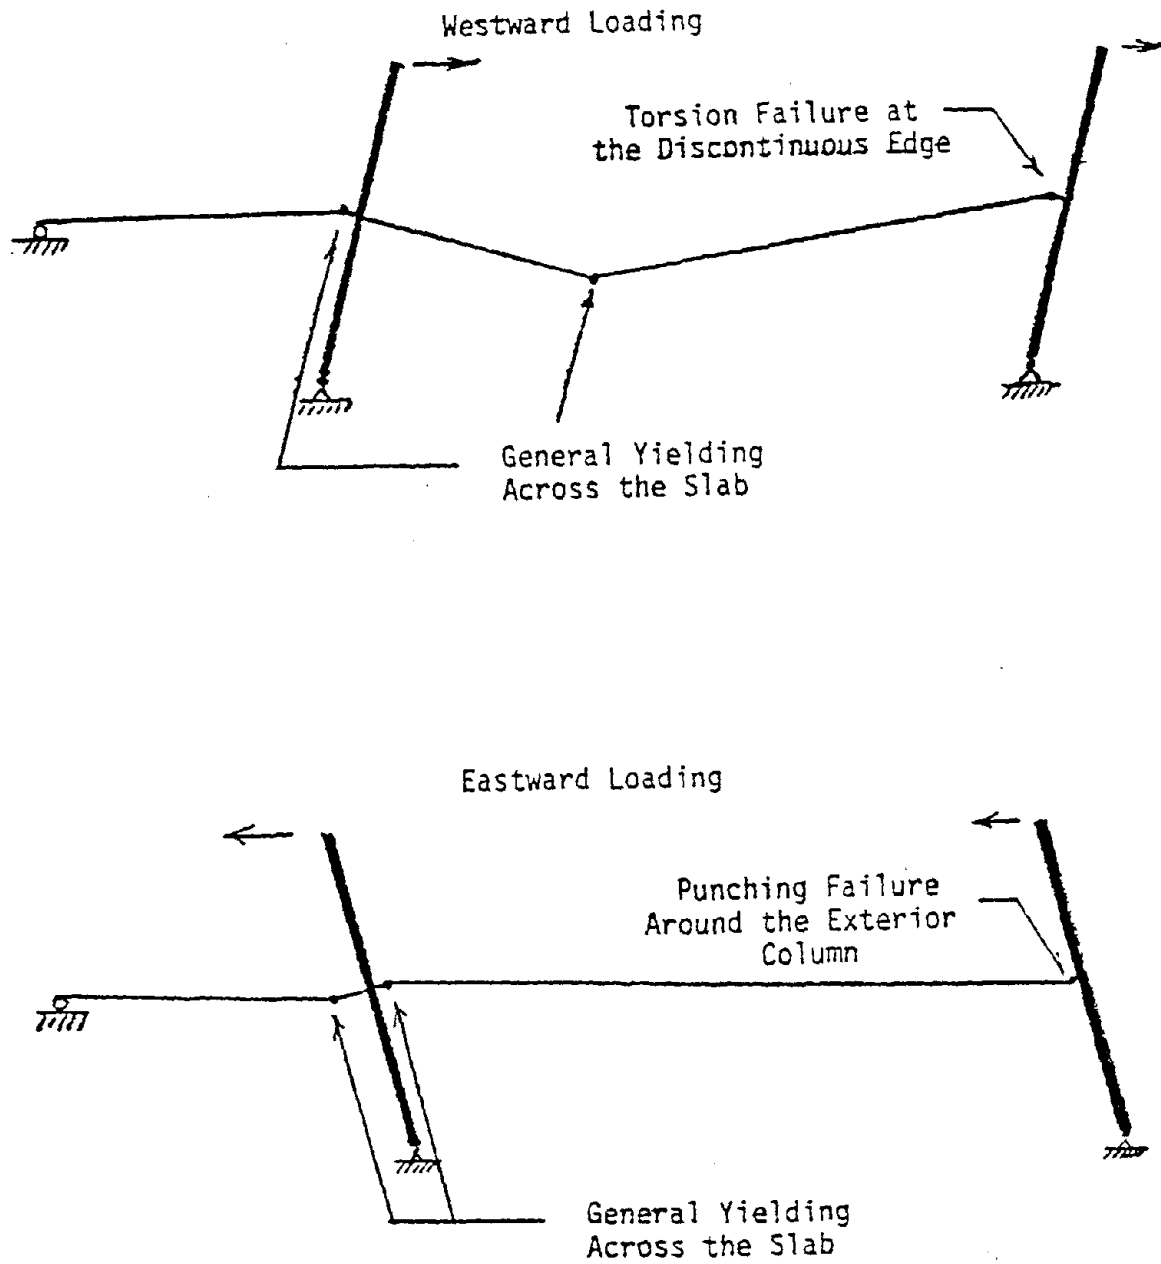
SCHEMATIC DIAGRAM OF FAILURE MODES IN TEST
